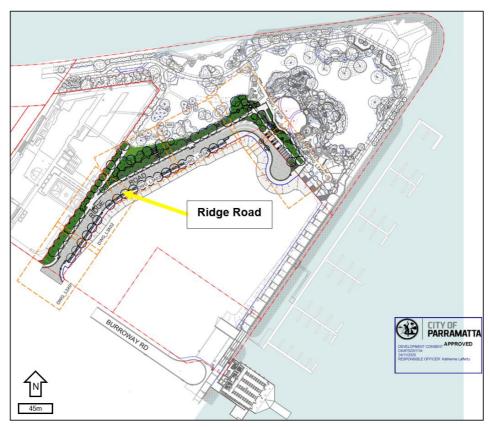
| The approved concept master plan layout (Source: Applicant's AR 2022)
